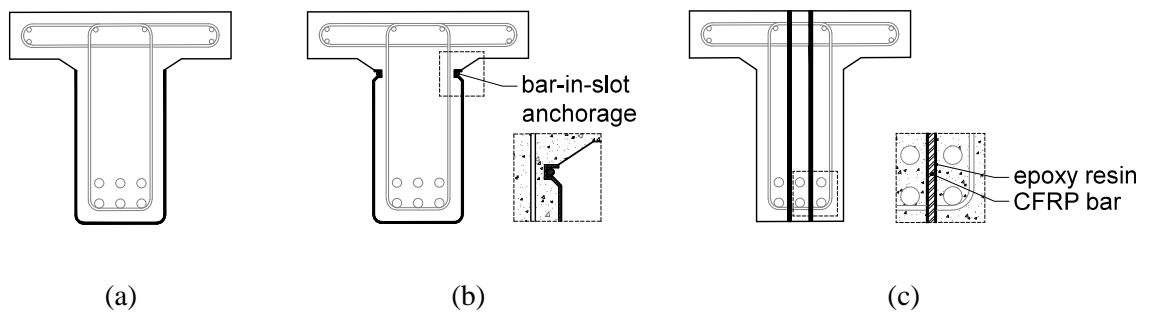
T-beams – tested strengthening configurations – through sections: (a) U-wrap without end anchorage, (b) U-wrap with bar-in-slot end-anchorage system, and (c) specimen strengthened with deep embedded bars.
